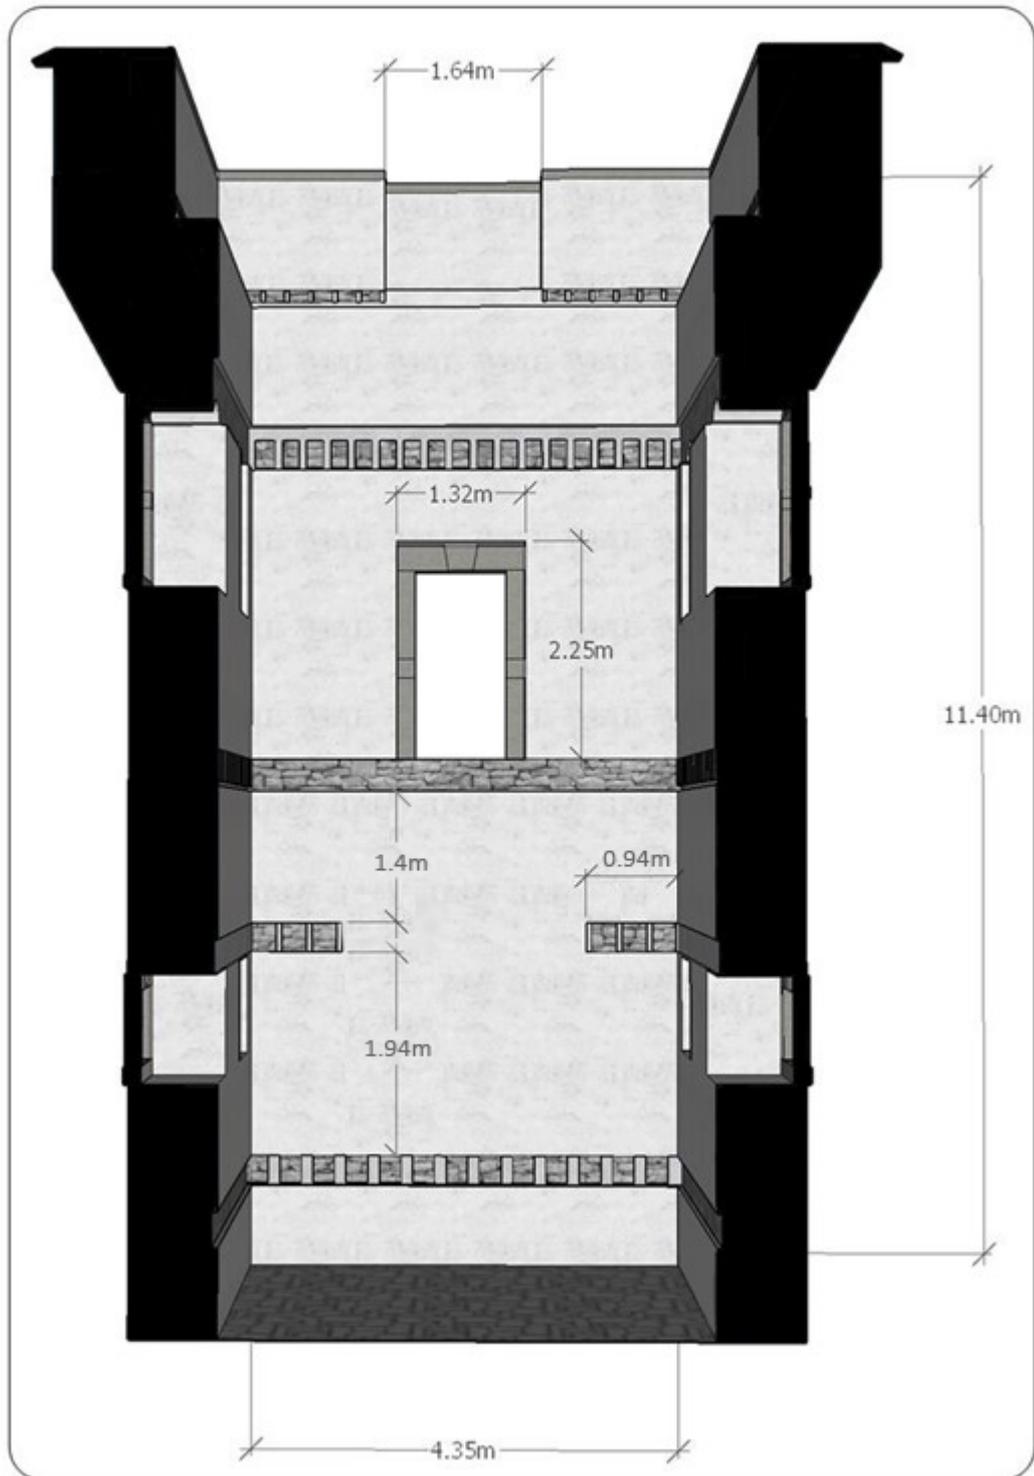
Cut away view of 3D model for an idealised tower showing interior face of front wall, door and entrance to machicolation.
